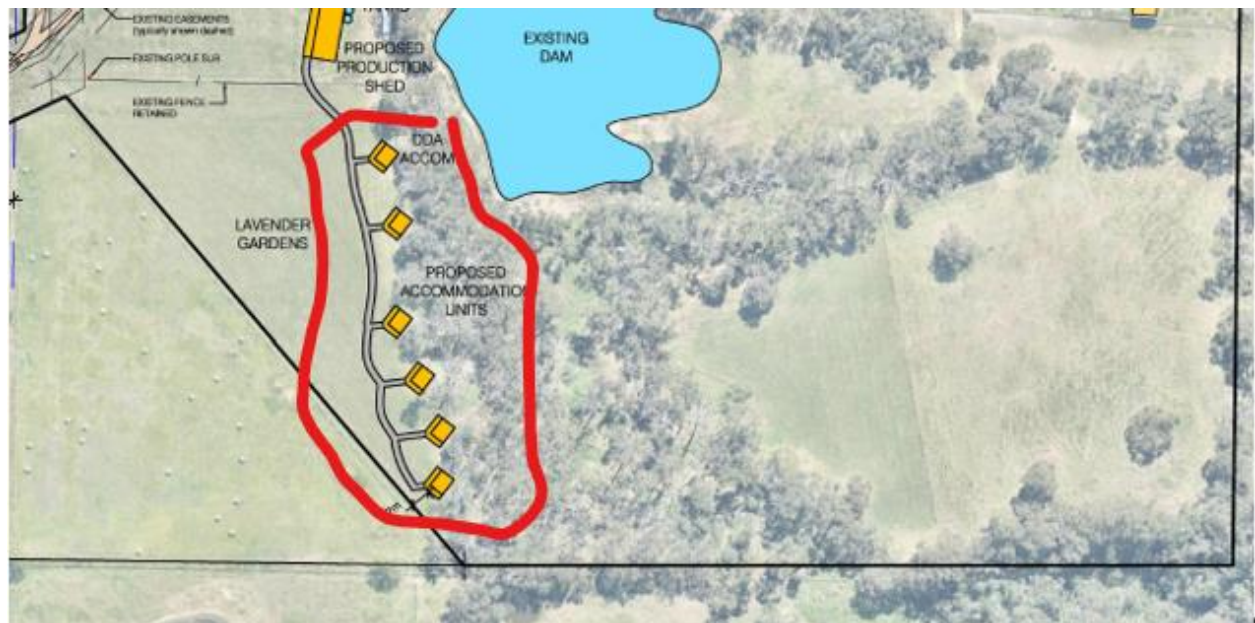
Location of approved accommodation buildings under P17/1892 (source: Advertised plans under P17/1892 16 February 2018)
